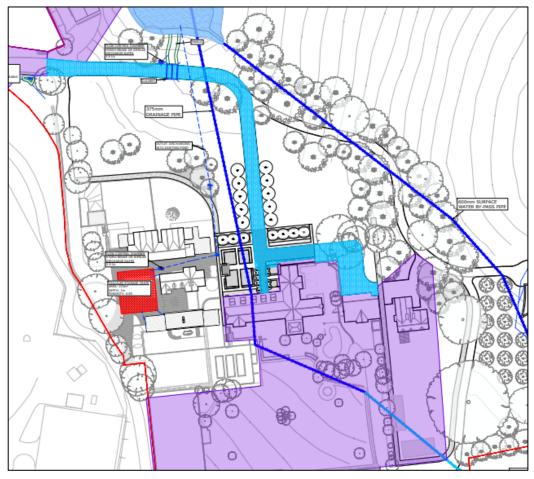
Indicative drainage layout plan for the proposed driveway (permeable), shown in blue.
